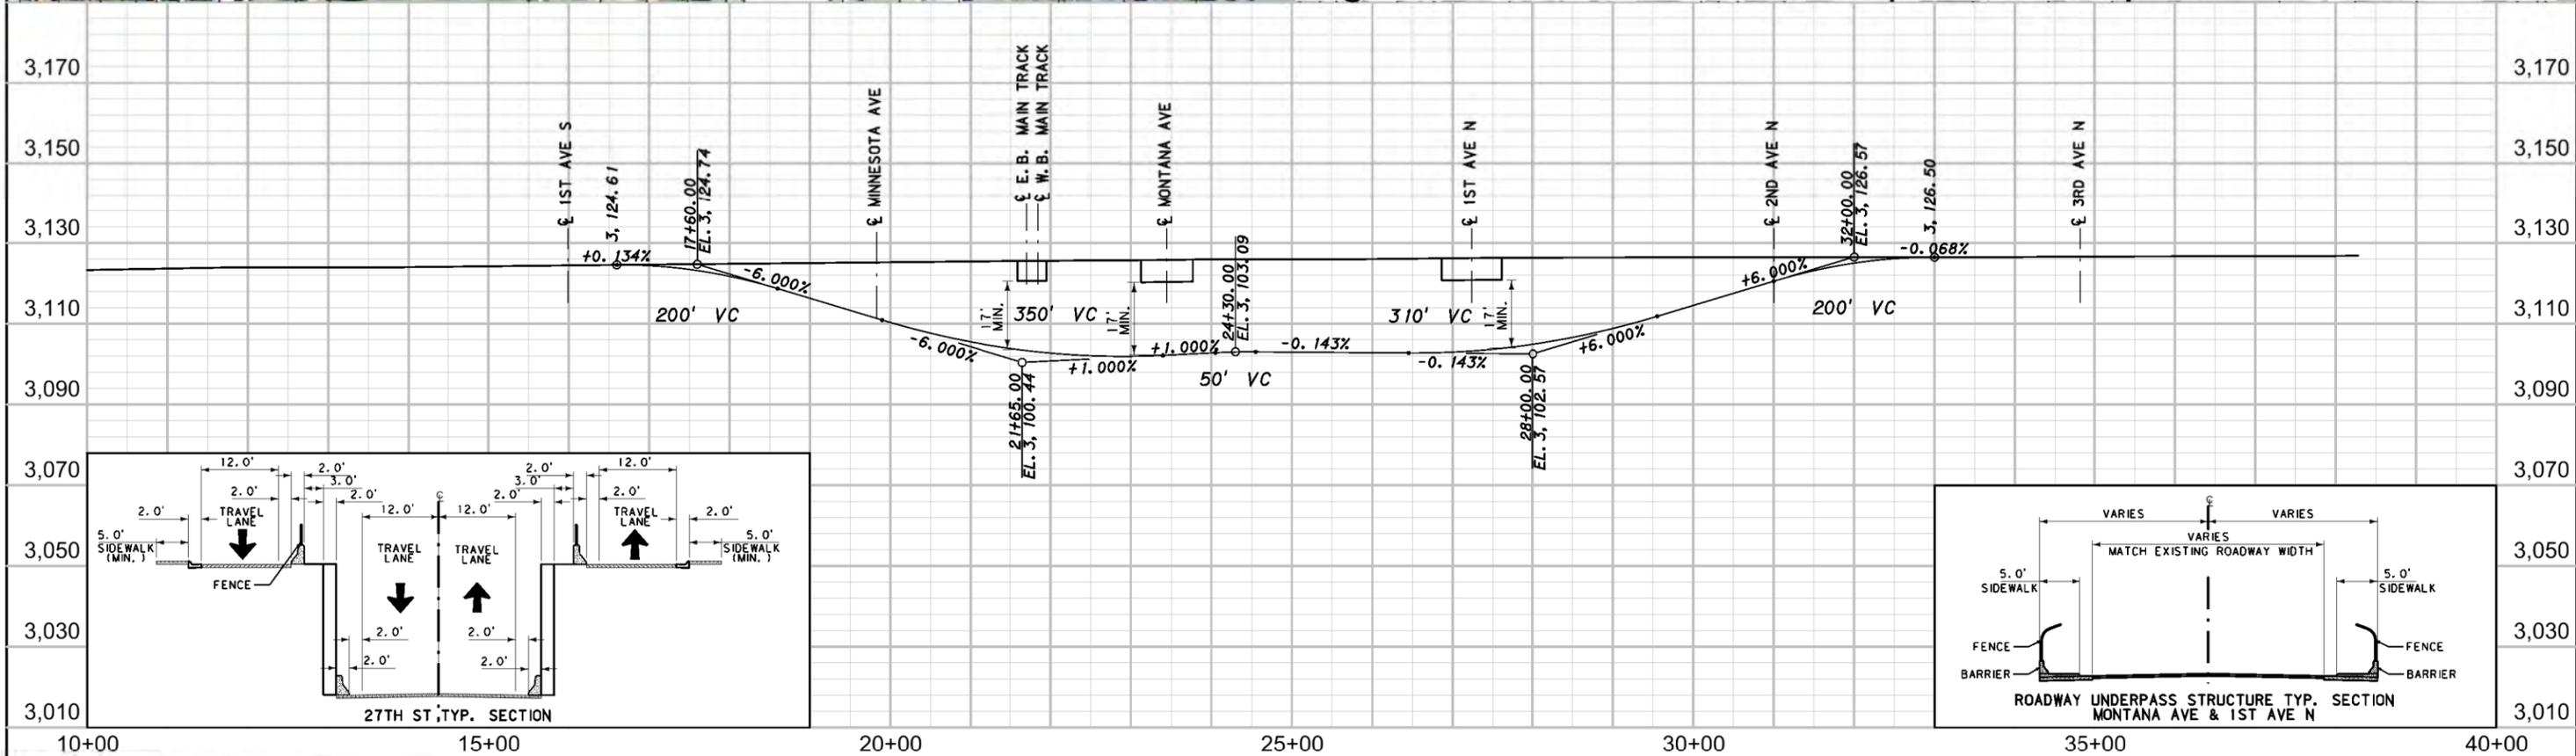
27th Street Underpass Conceptual Plan and Profile
